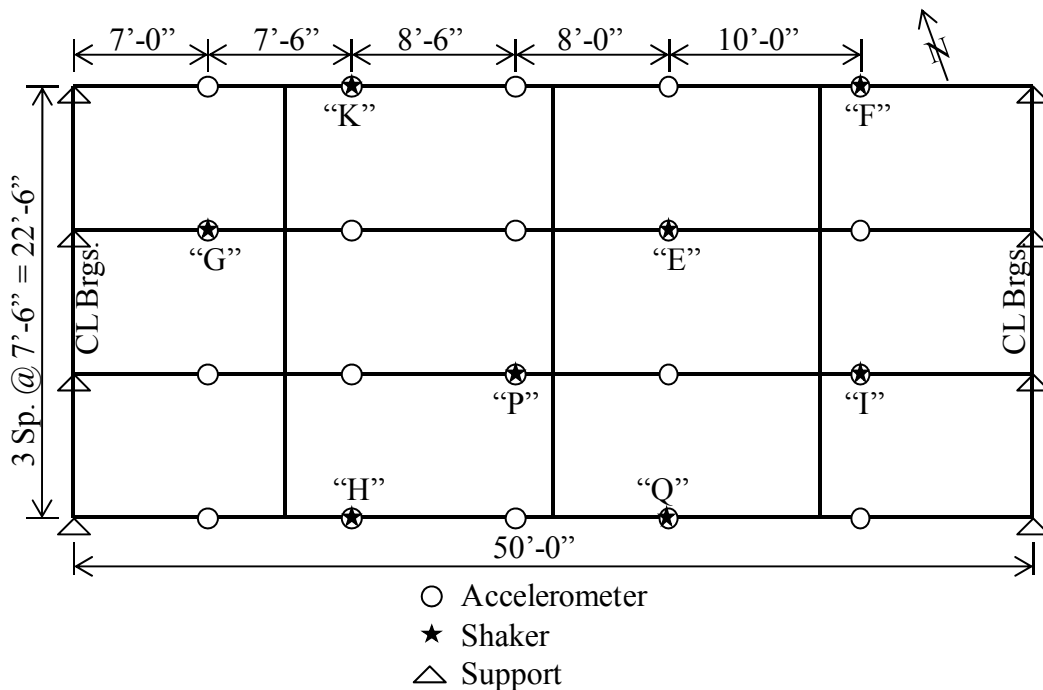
Spatial arrangement of shakers shown on bridge framing plan for testing using eight shakers.
